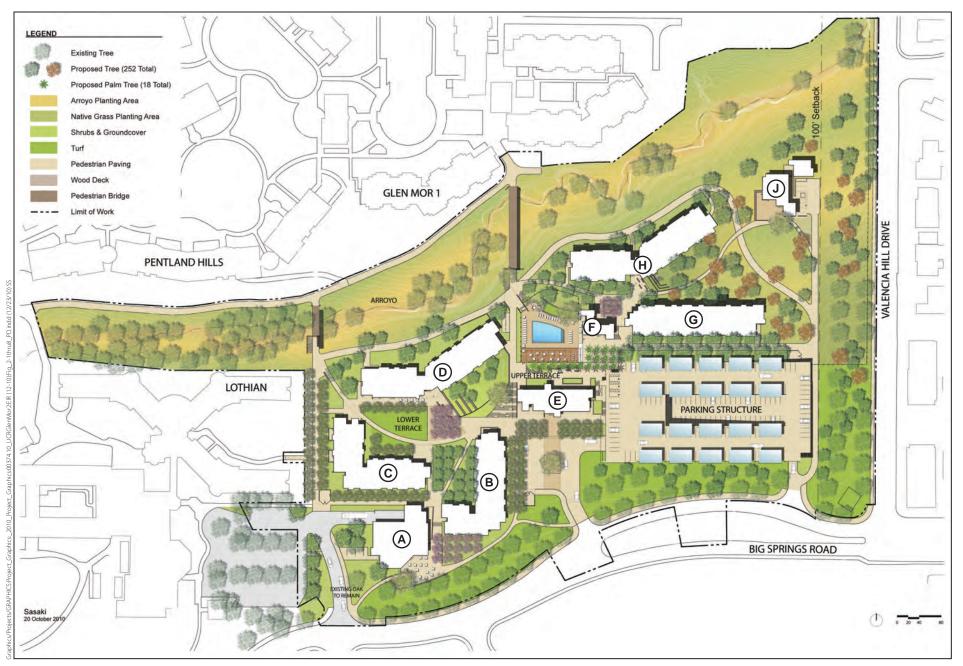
Project Site Plan and Landscape Plan Glen Mor 2 Student Apartments
